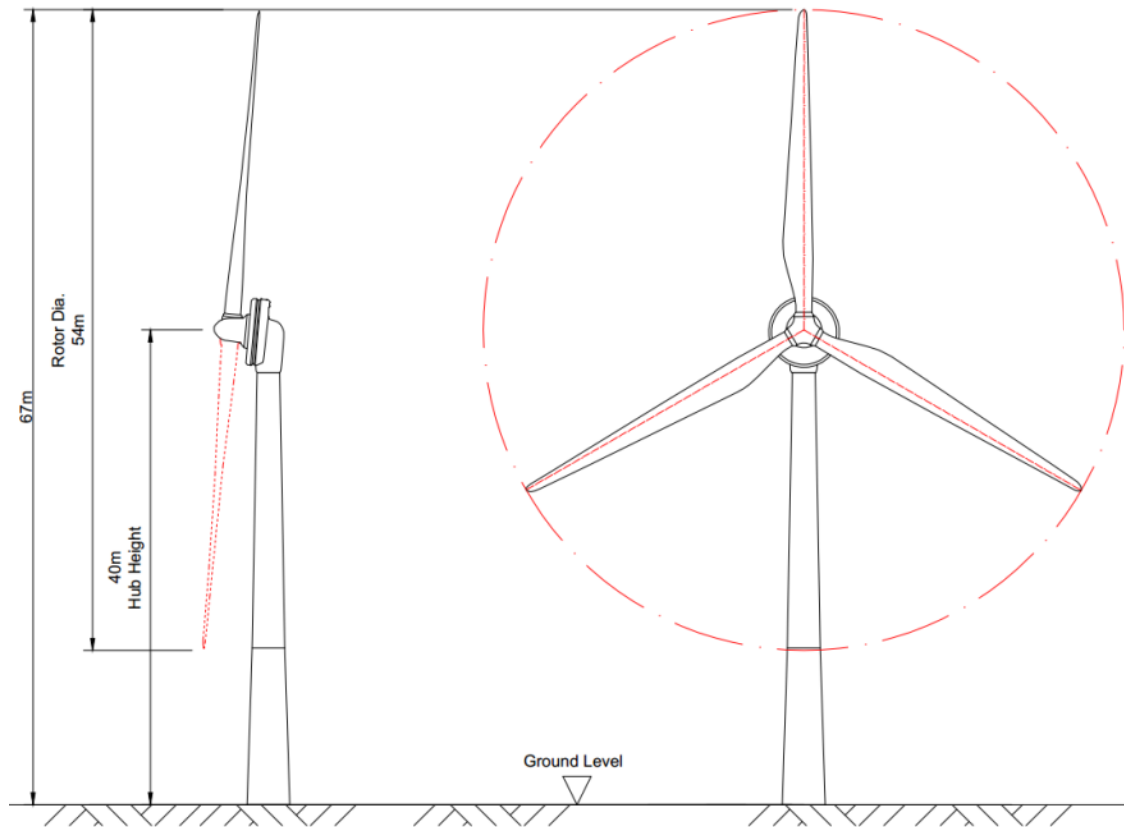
EWT 54 wind turbine showing principal dimensions
